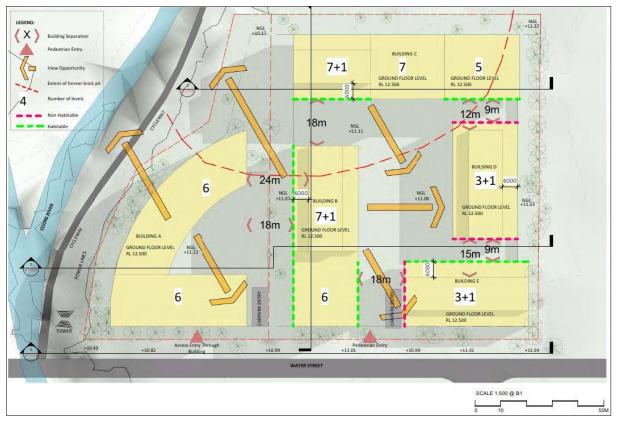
CONCEPT DESIGN - SITE PLAN
